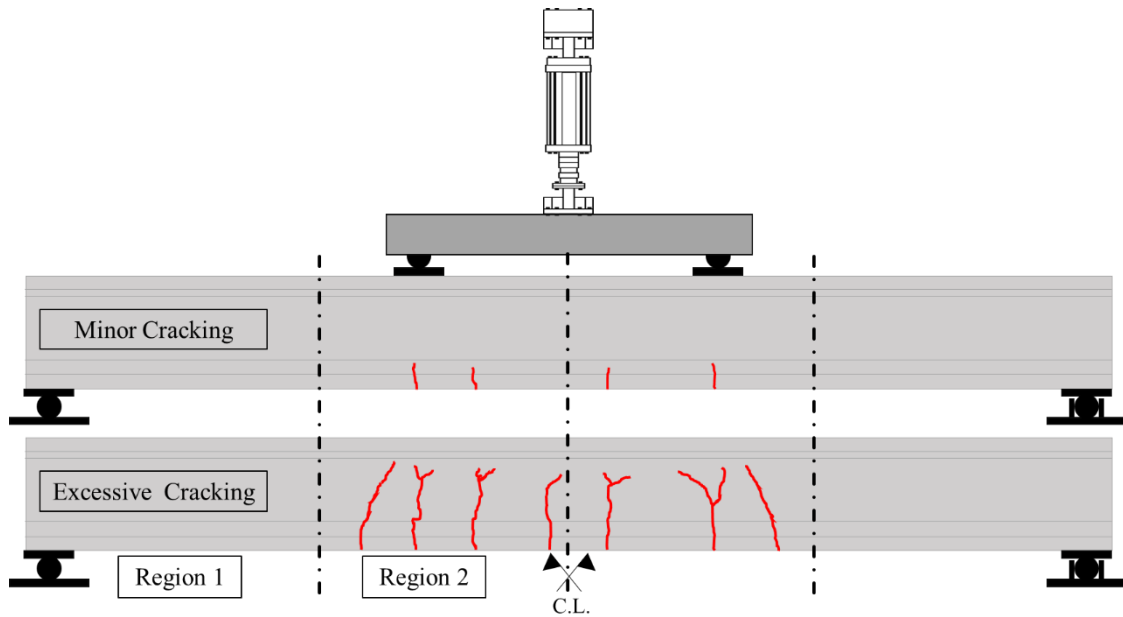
View of the beam showing minor and excessive cracking patterns
